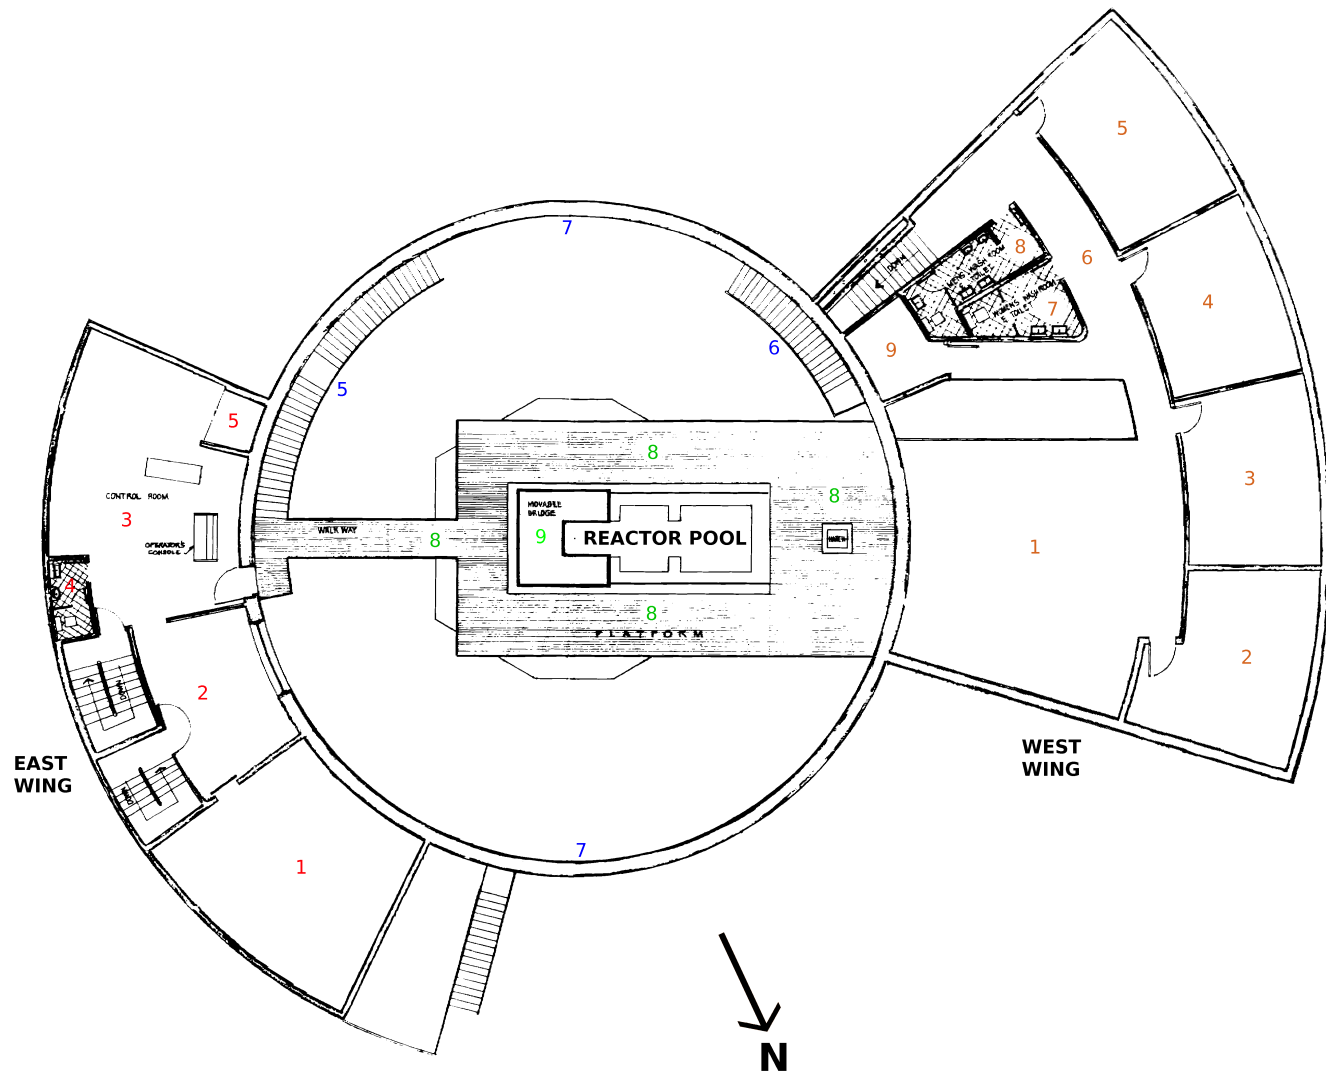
The Basement-Floor Plan of the Reactor Building
